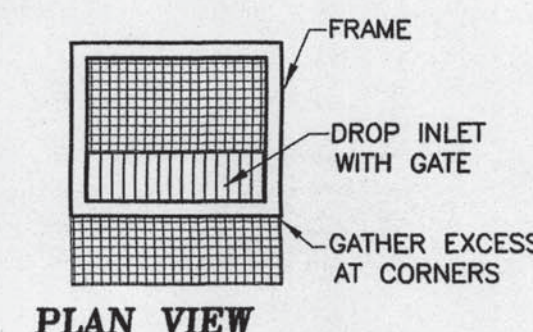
DETAIL OF DRAINAGE STRUCTURE INSTALLATION
